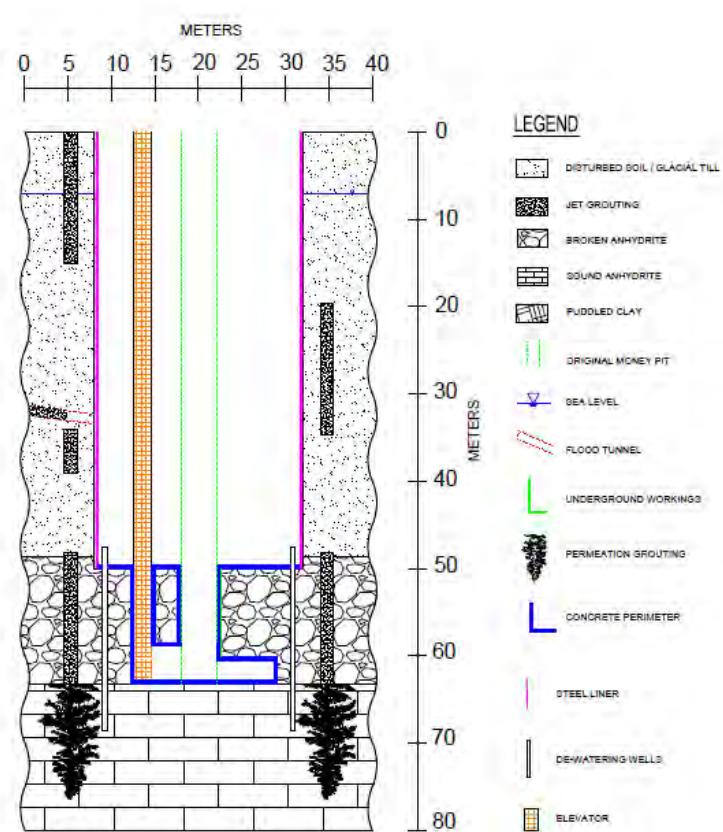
Cross-section of the installation of a concrete slab in the base of the excavation
